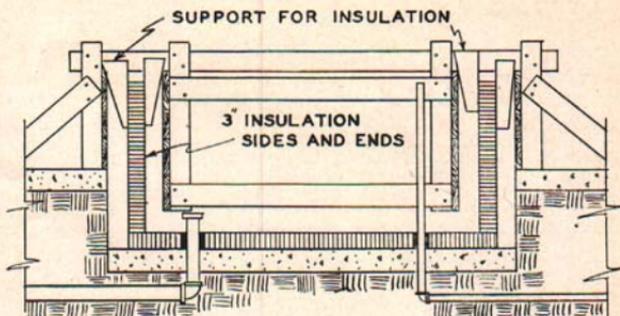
Step No. 4. The package insulation is placed in the center of the wall space and held in place by the wedges at the top. See details for arranging insulation in Fig. 8 (below).
